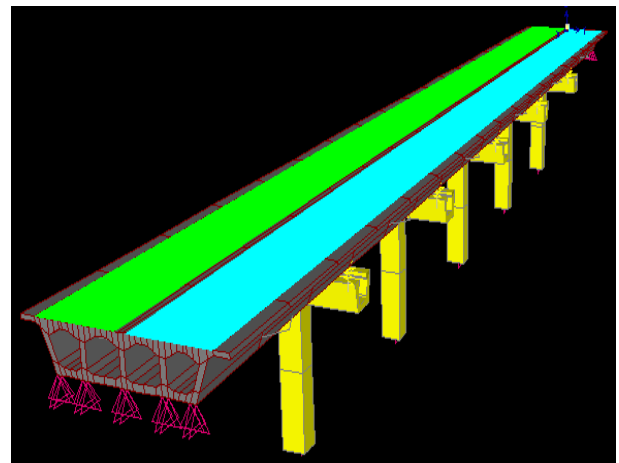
Finite Element model of trapezoidal box girder bridge Superstructure created in SAP 2000
